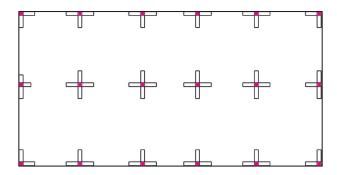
Soft Storey Improvement by using L, T, + shape columns at ground floor
